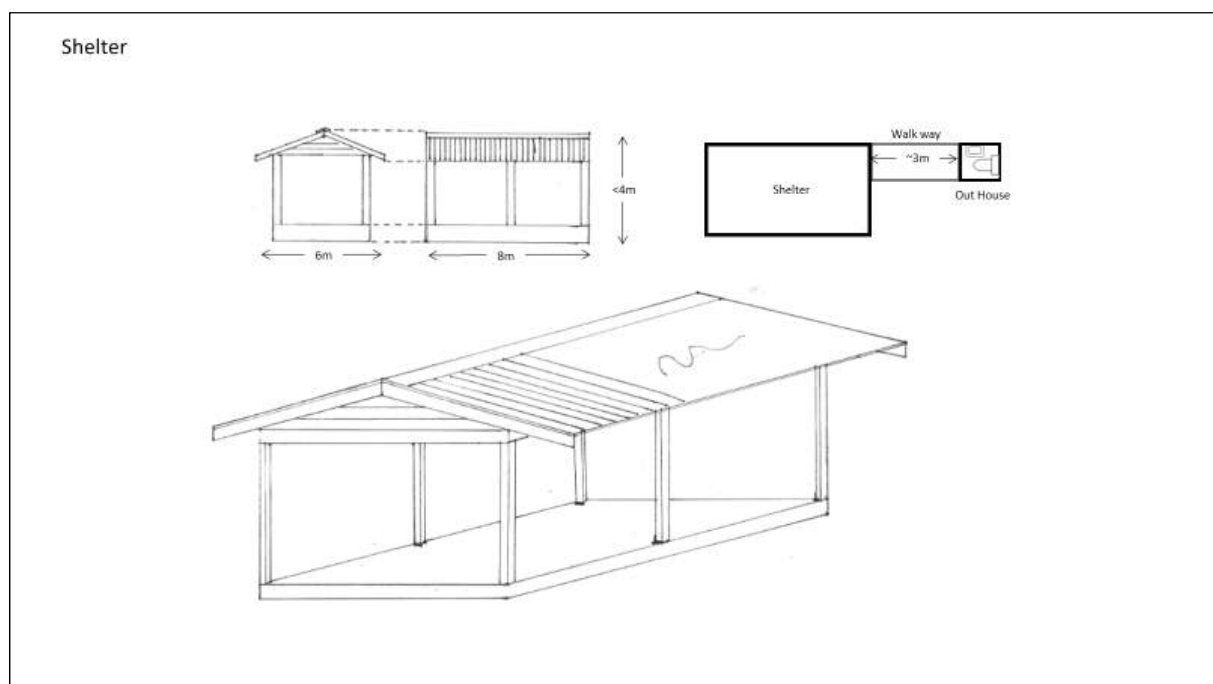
Concept Drawing 1 – Typical Site / Camp Kitchen Shelter Structure
